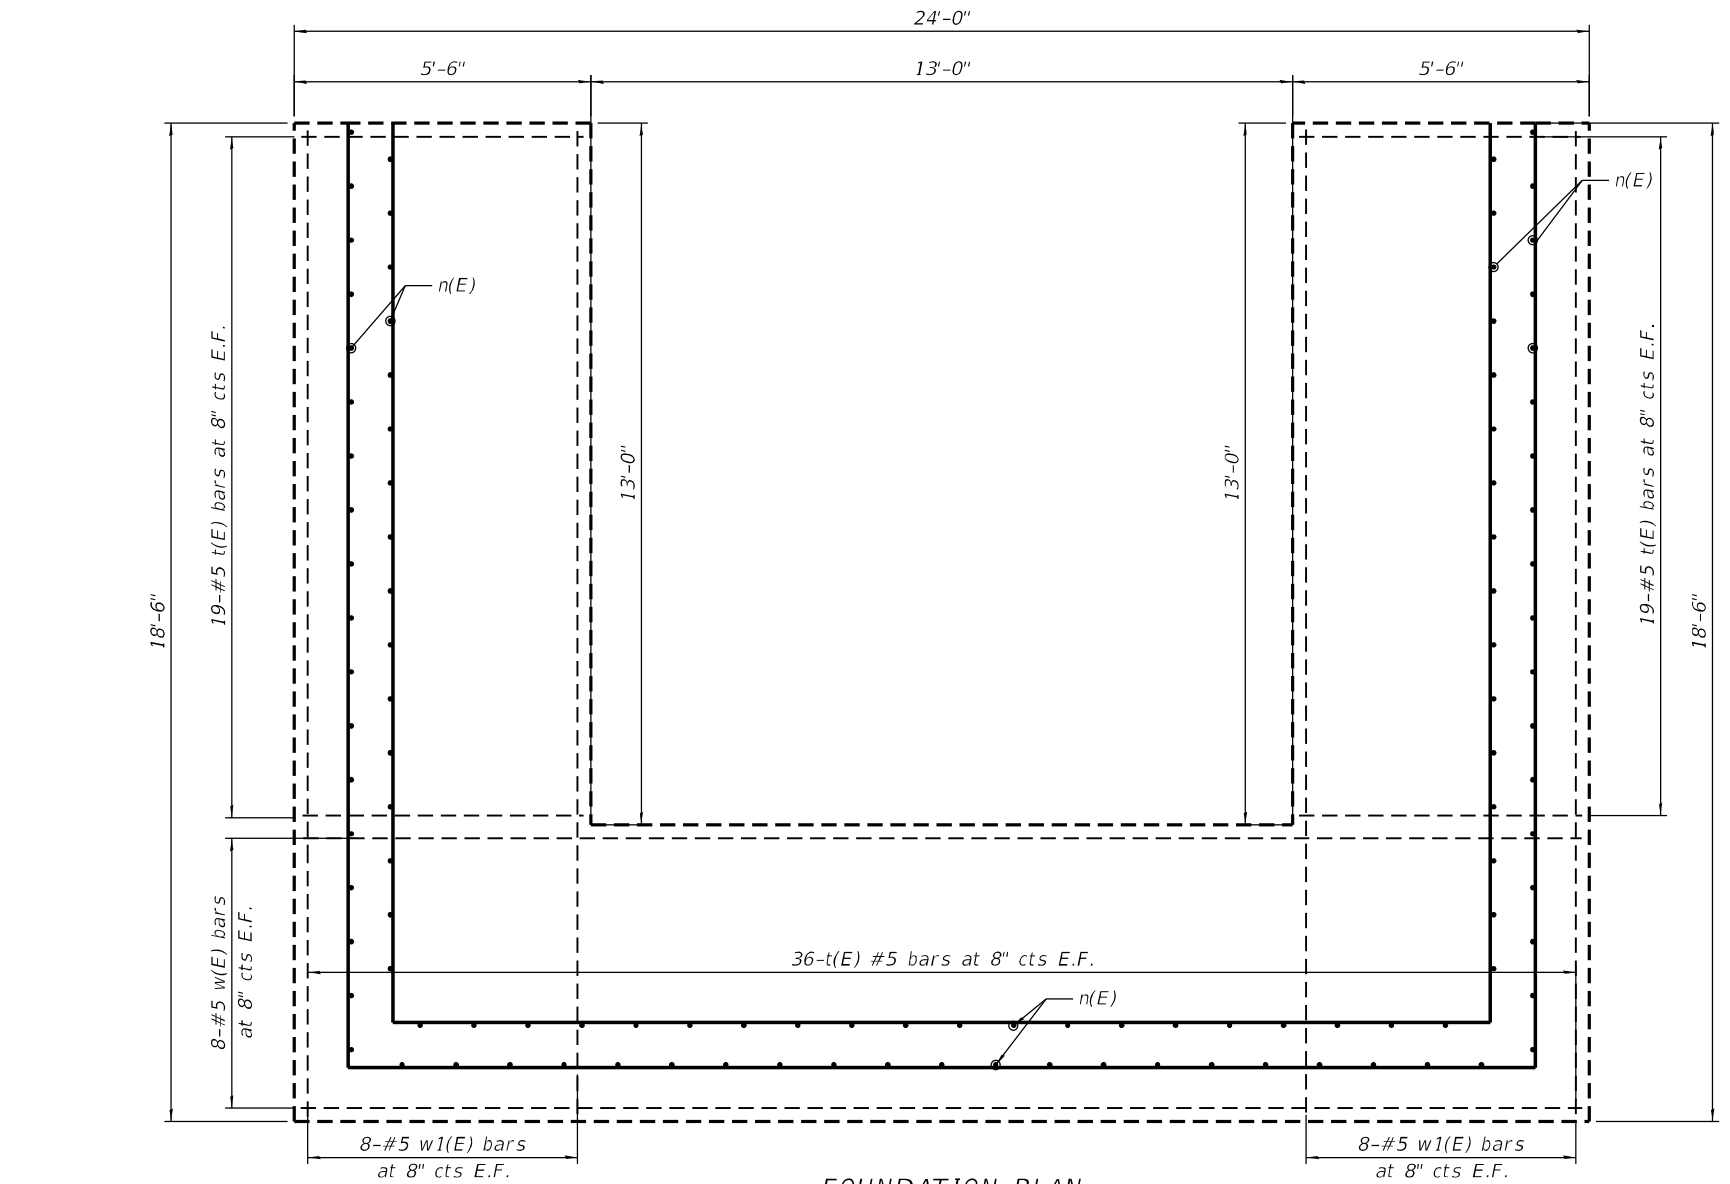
DETAILED PLAN AND ELEVATION (RETAINING WALL)
